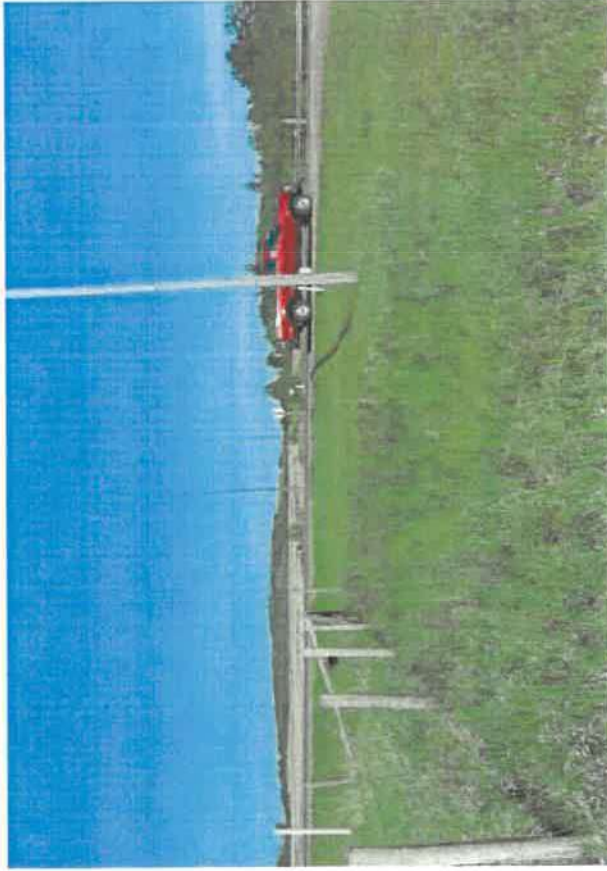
Looking West at intersection. Guardrail wraps around flare.
